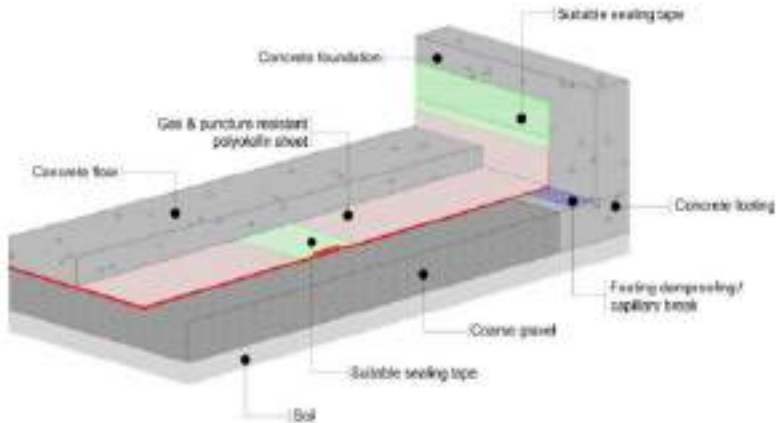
Sealing sub-slab membrane vertically to concrete foundation wall
